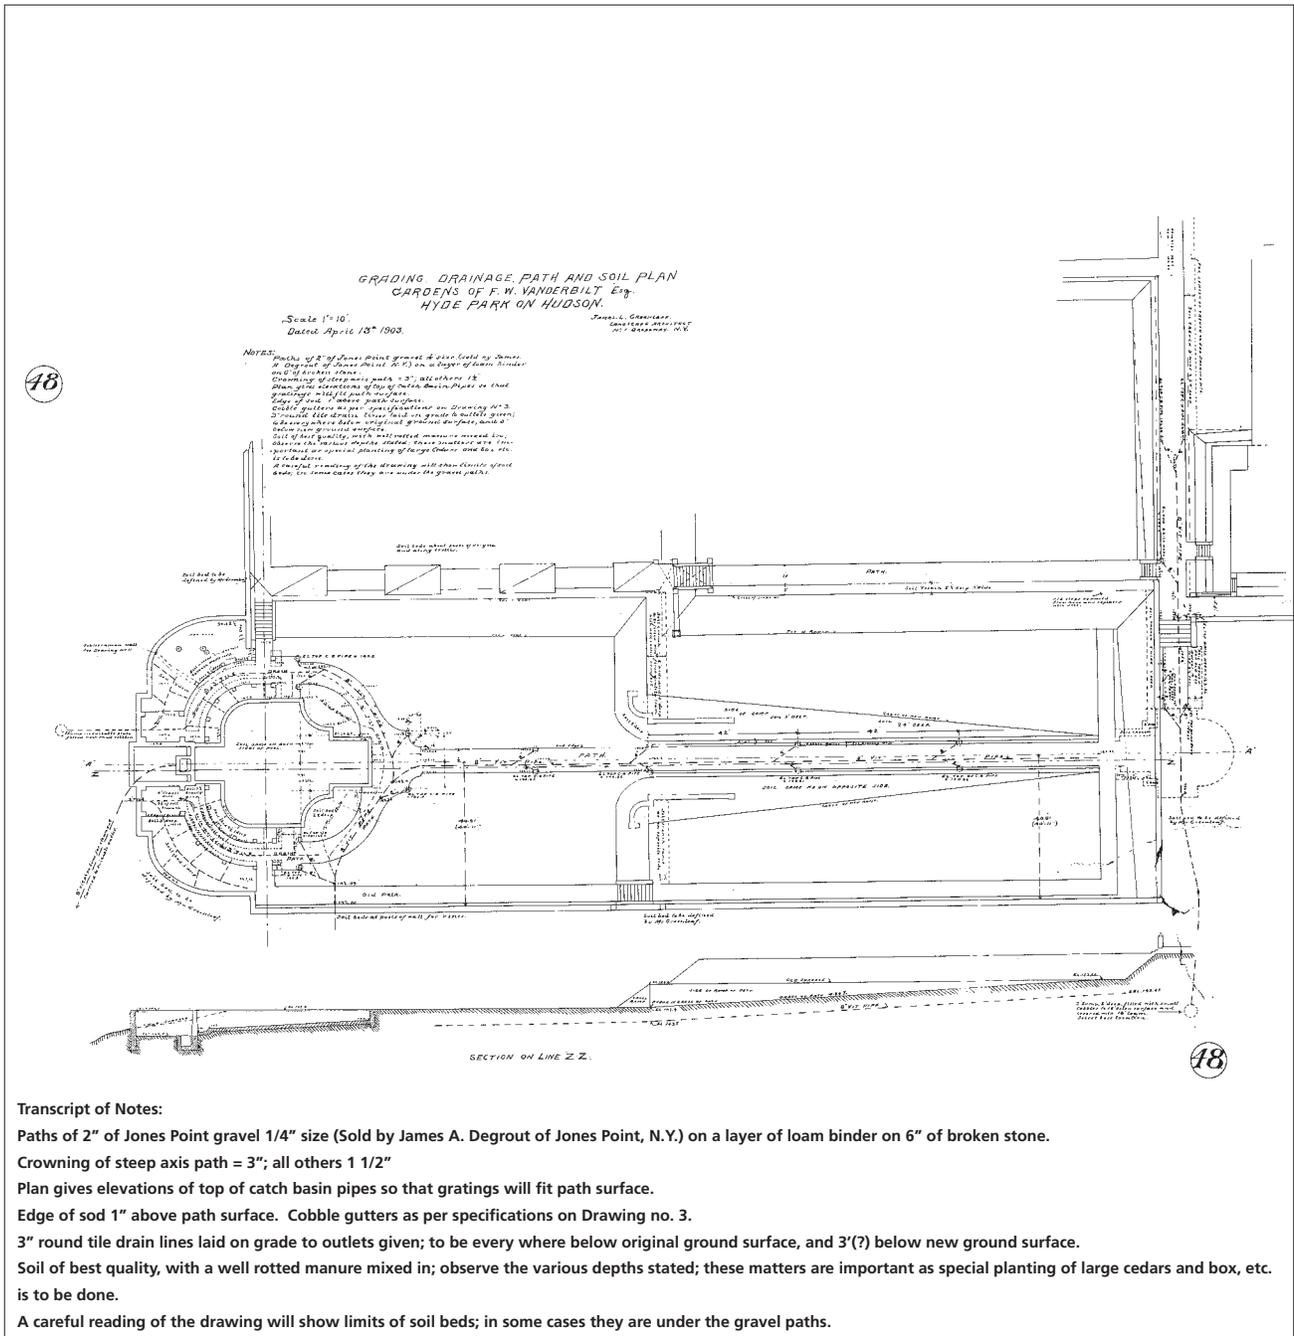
"Grading, Drainage, Path and Soil Plan, Gardens of F.W. Vanderbilt, Esq., Hyde Park, N.Y.," James L. Greenleaf. Landscape architect, Plan #48, April 13, 1903. Greenleaf's notes on the plan have been transcribed for legibility (VAMA, no. V-114).
